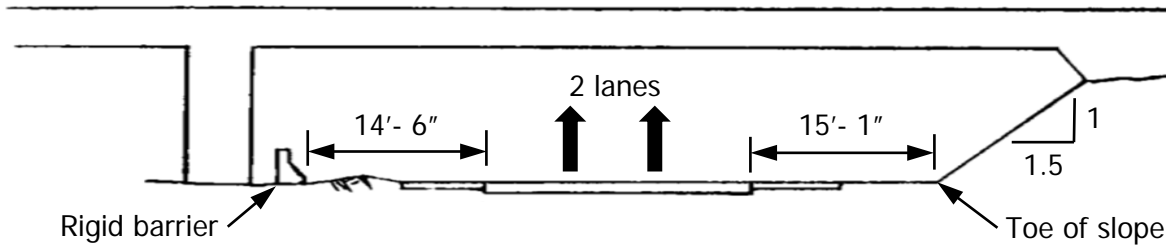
Bridge elevation view of horizontal clearances for a 2-lane, 1-way highway feature below the bridge, with a rigid barrier.
